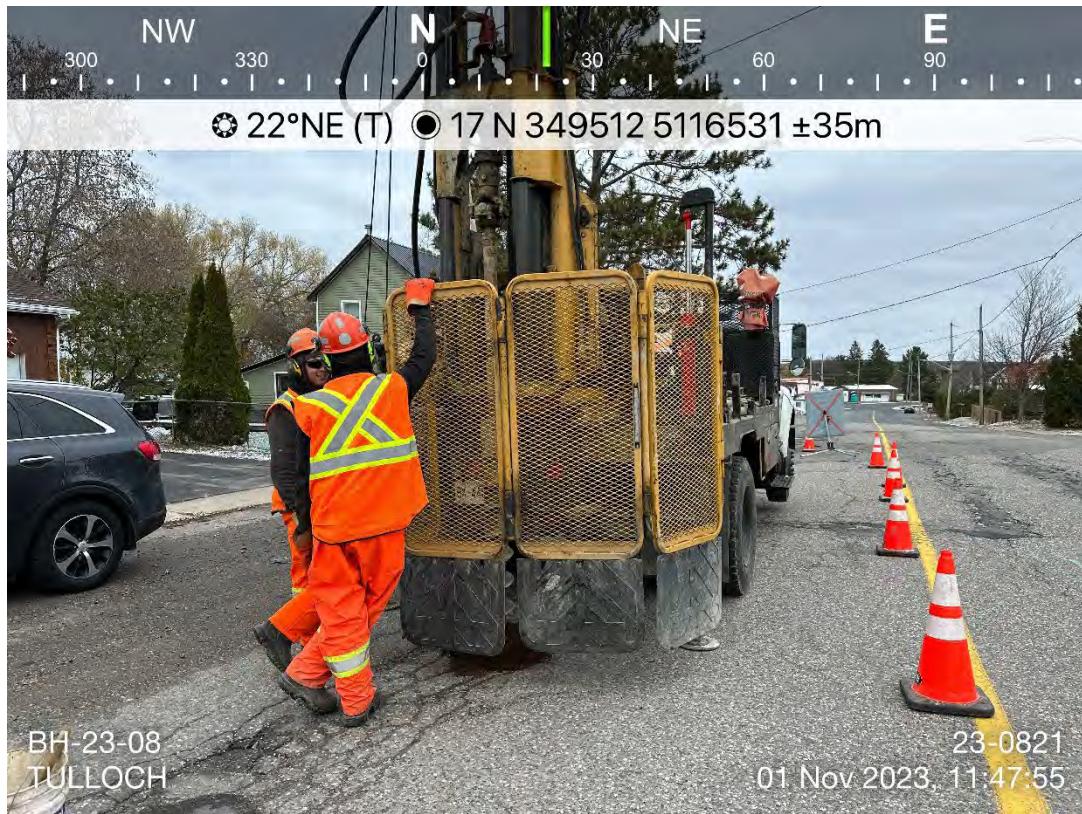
BH-23-08 during advancement. Photo taken facing northeast.
